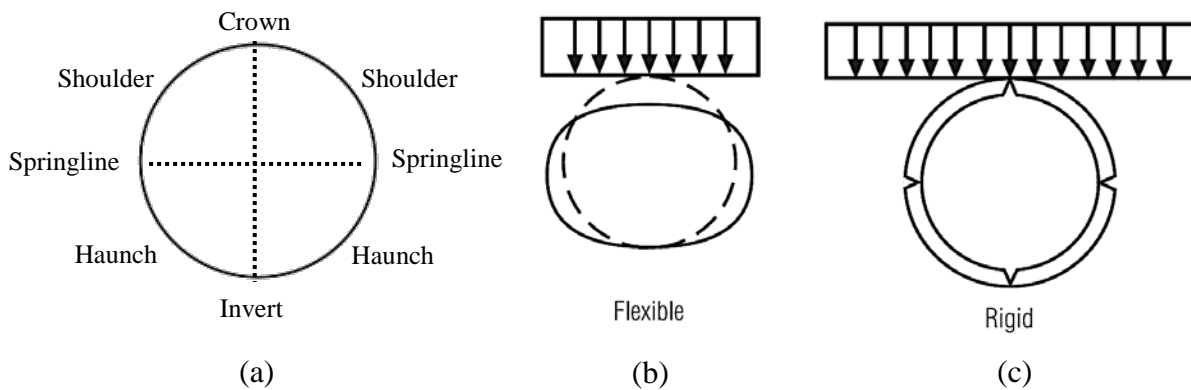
Culvert response: (a) Terminology for a culvert cross section, (b) flexible culvert, and (c) rigid culvert behavior.
